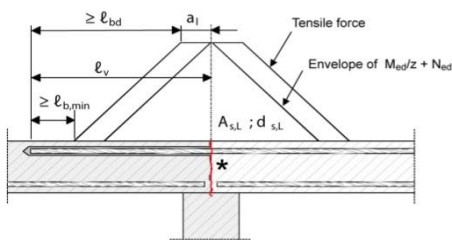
End anchoring of slabs or beams, designed as simply supported.
